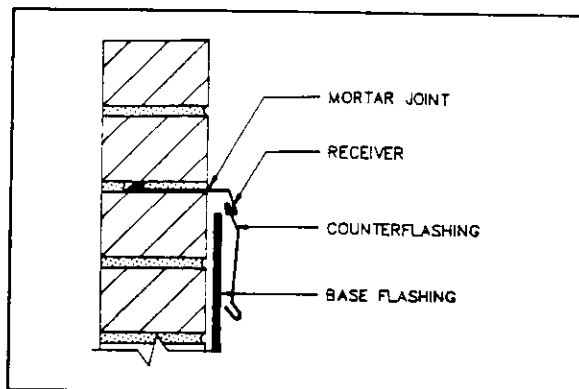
Reglet-Mounted Two-Piece Counterflashing
